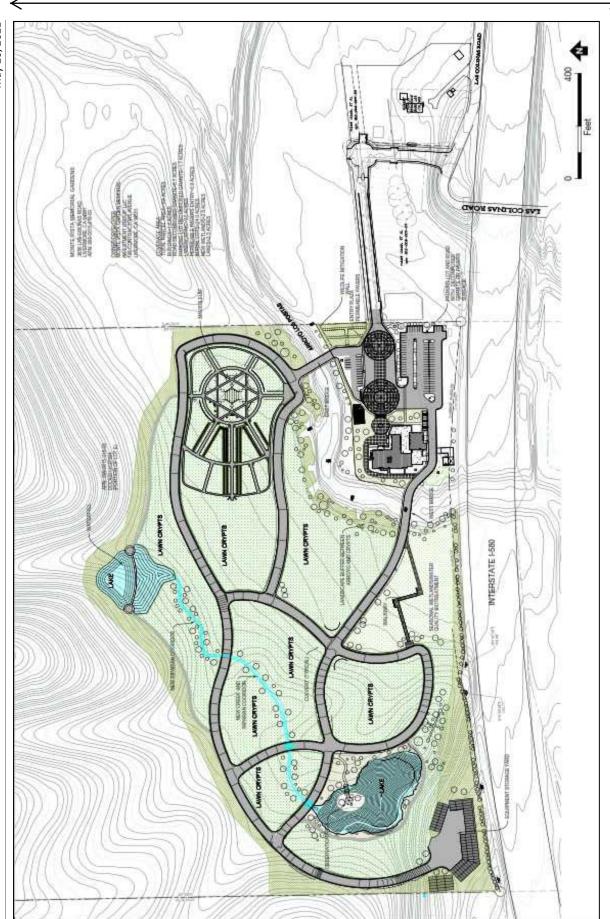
Preliminary Project Site Plan- Source: RCH Group (ENGEO 2020)
